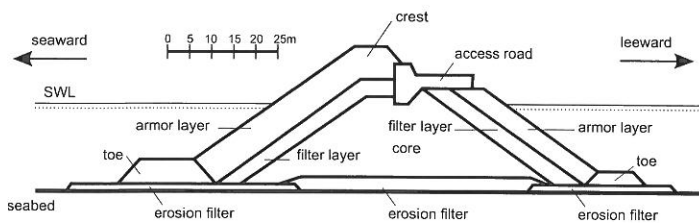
Typical cross-section of a (nonvertoppable) RMB (adapted from Troch, 2000).
